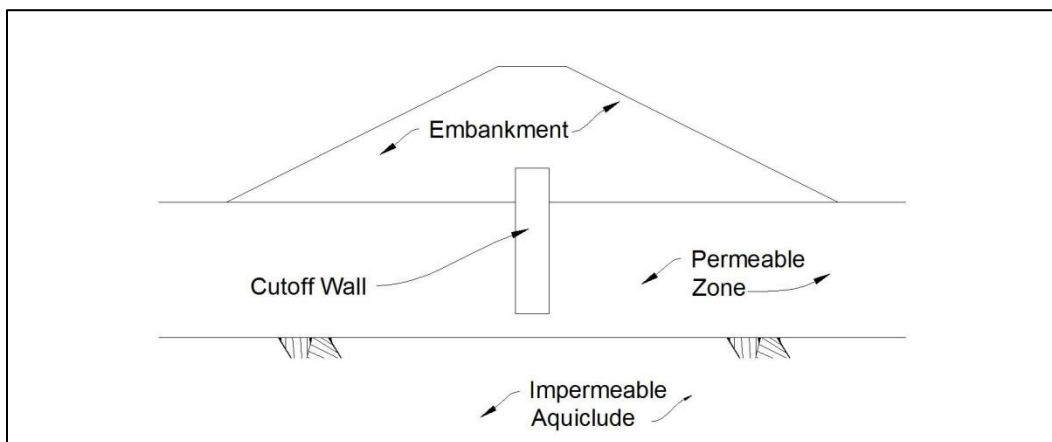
Partially penetrating cutoff wall (lengthens seepage path).
